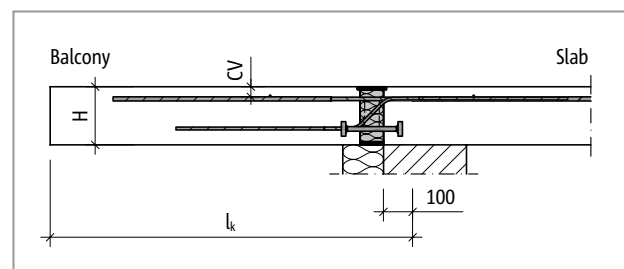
Schöck Isokorb® T type K-M12: Static system
